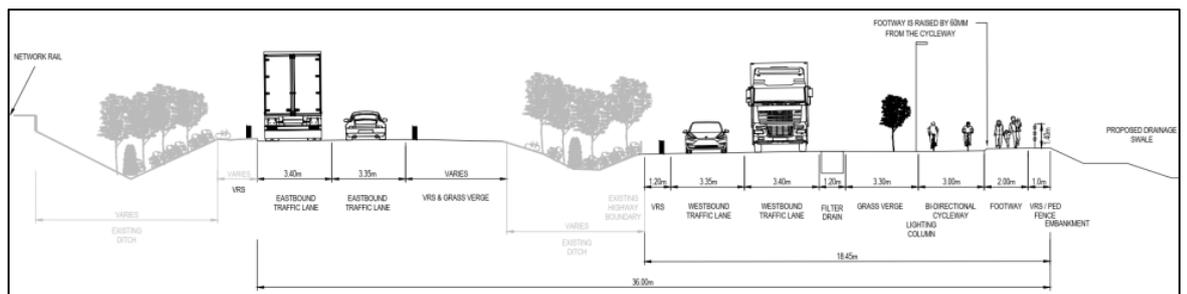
A4130 Widening typical cross section, east of the western access to Valley Park
